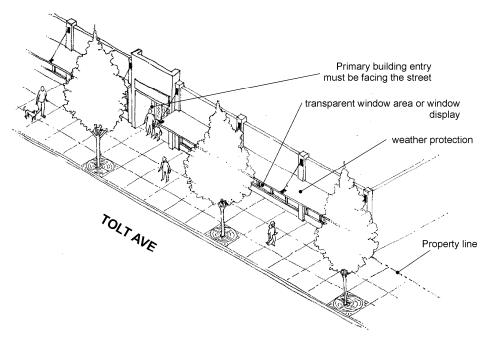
Pedestrian-oriented facades facing Tolt Avenue.
